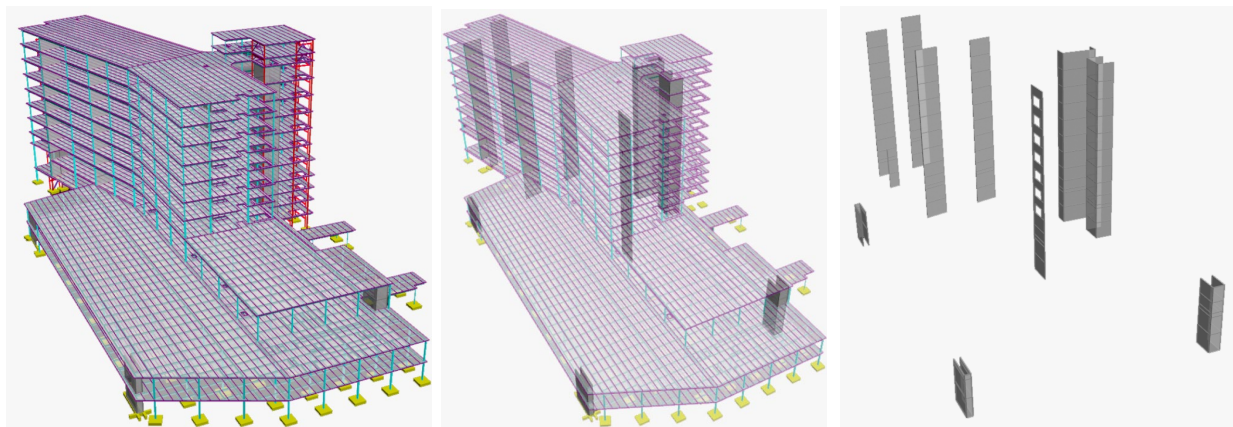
Redesigned Structural Systems Modeled in RAM SS
